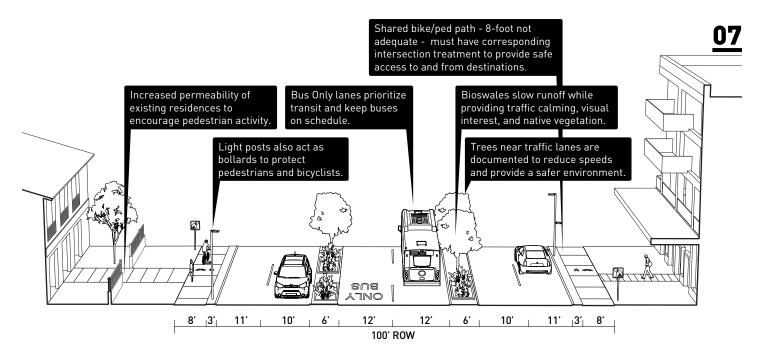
Greens Road Potential 100' ROW Cross Section
